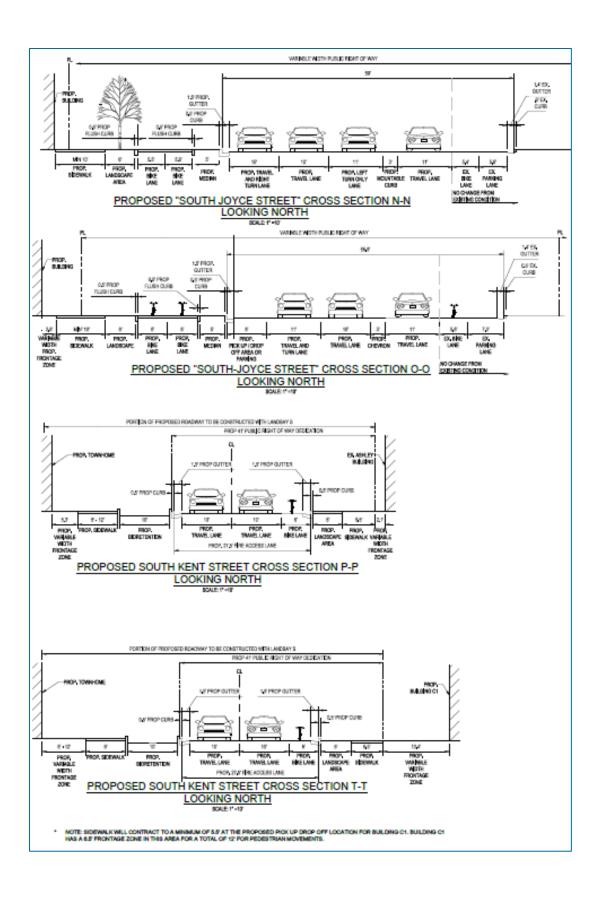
Proposed Street Cross-Sections (Source: PDSP Submission, Sheet CIV704)
